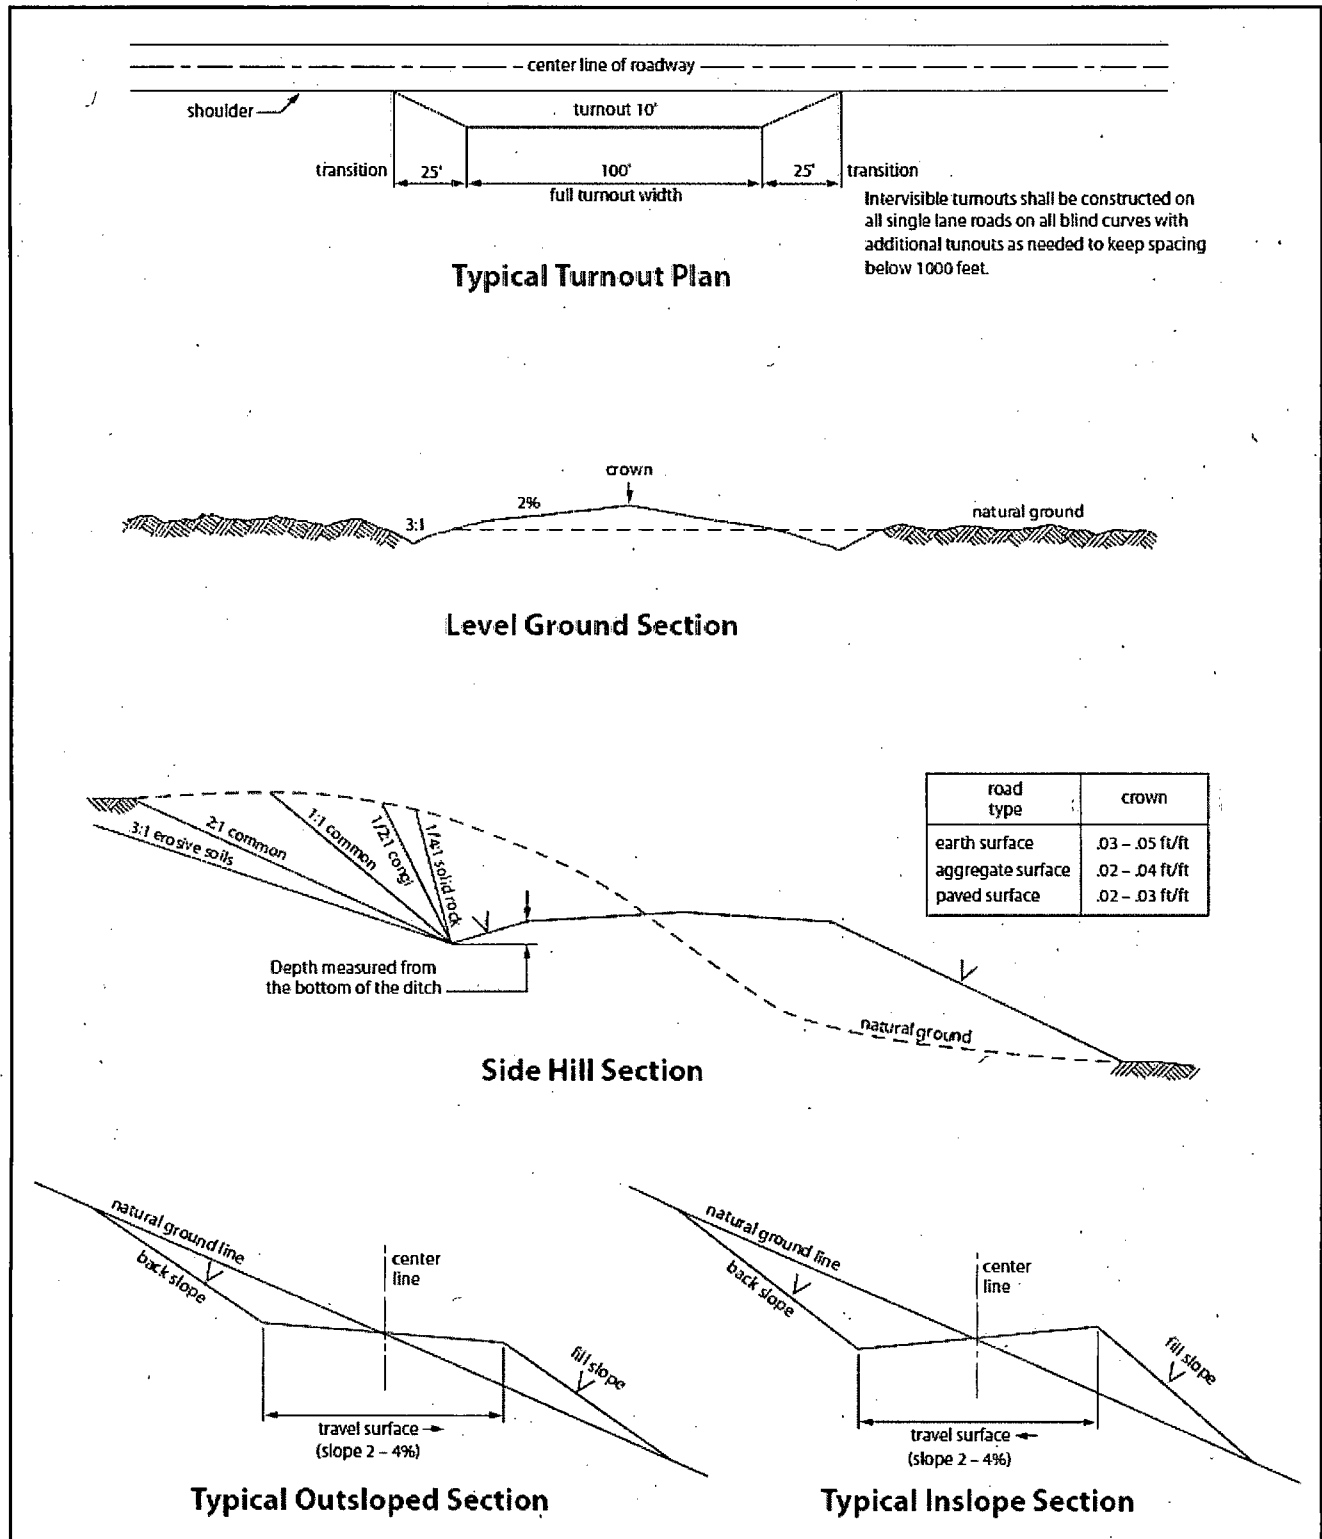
Cross-sections and plans for typical road sections representative of BLM resource or FS local and higher-class roads.
